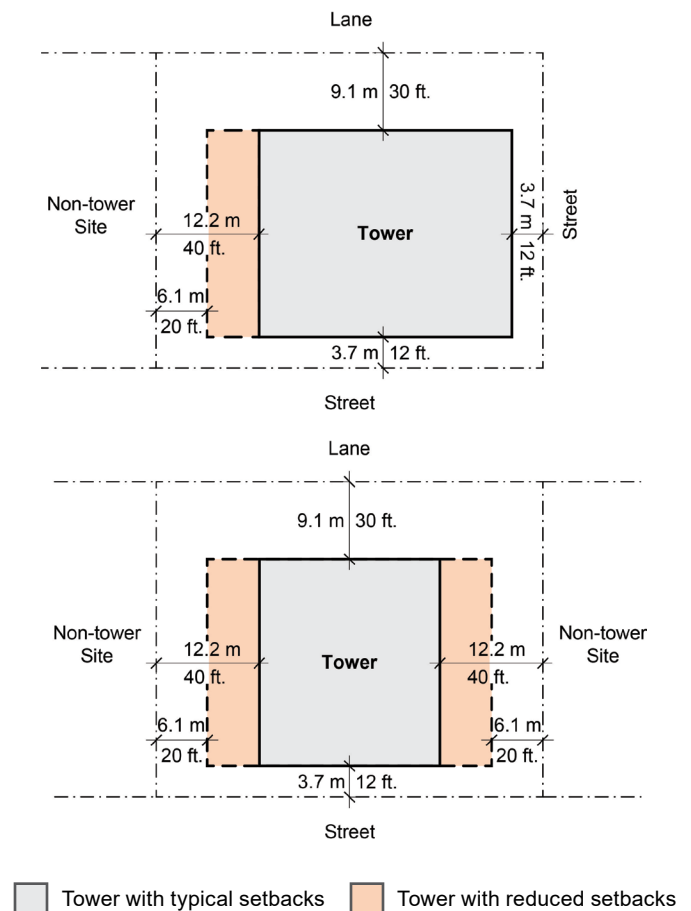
Plan diagrams illustrating tower setbacks and supported reductions on a corner site (top) and mid-block site (bottom).
